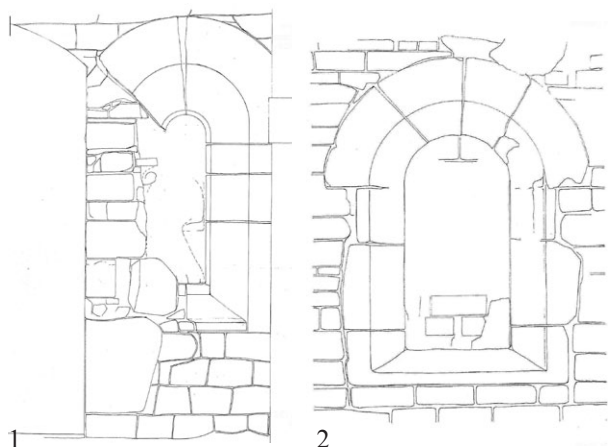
Window in south (1) and east (2) elevation, 2005,
